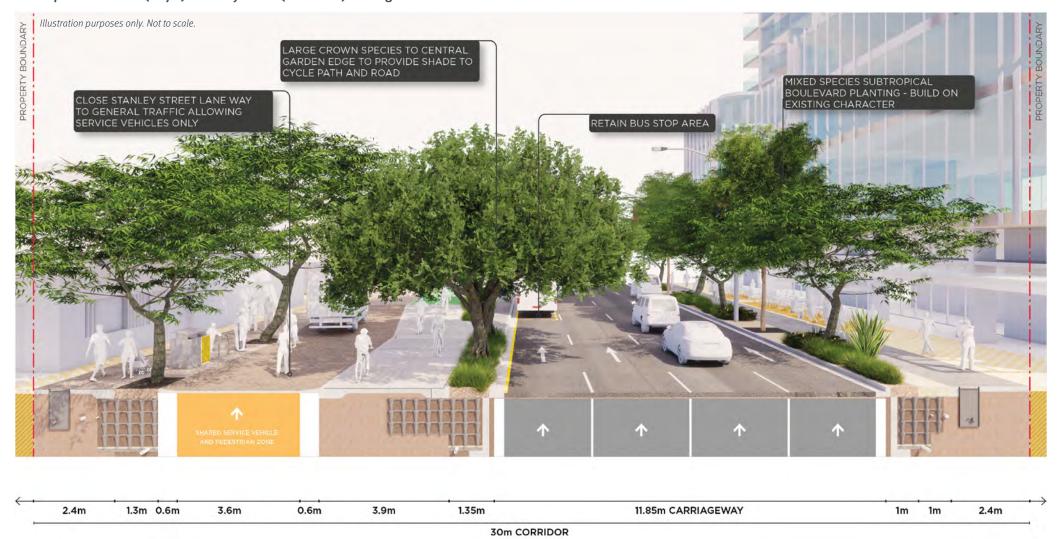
Cross section - Stanley Street - Precinct 1 - subtropical boulevard (major)
